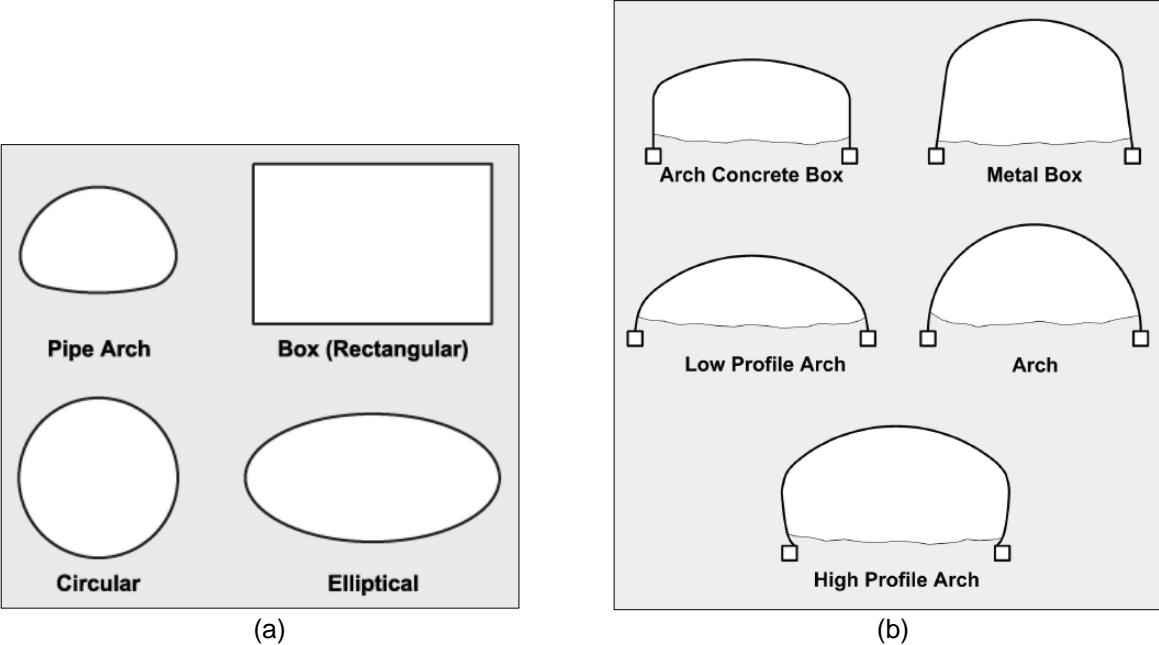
Commonly used culvert shapes: (a) closed conduit culvert shapes, and (b) open-bottom culvert shapes (FHWA 2012).
